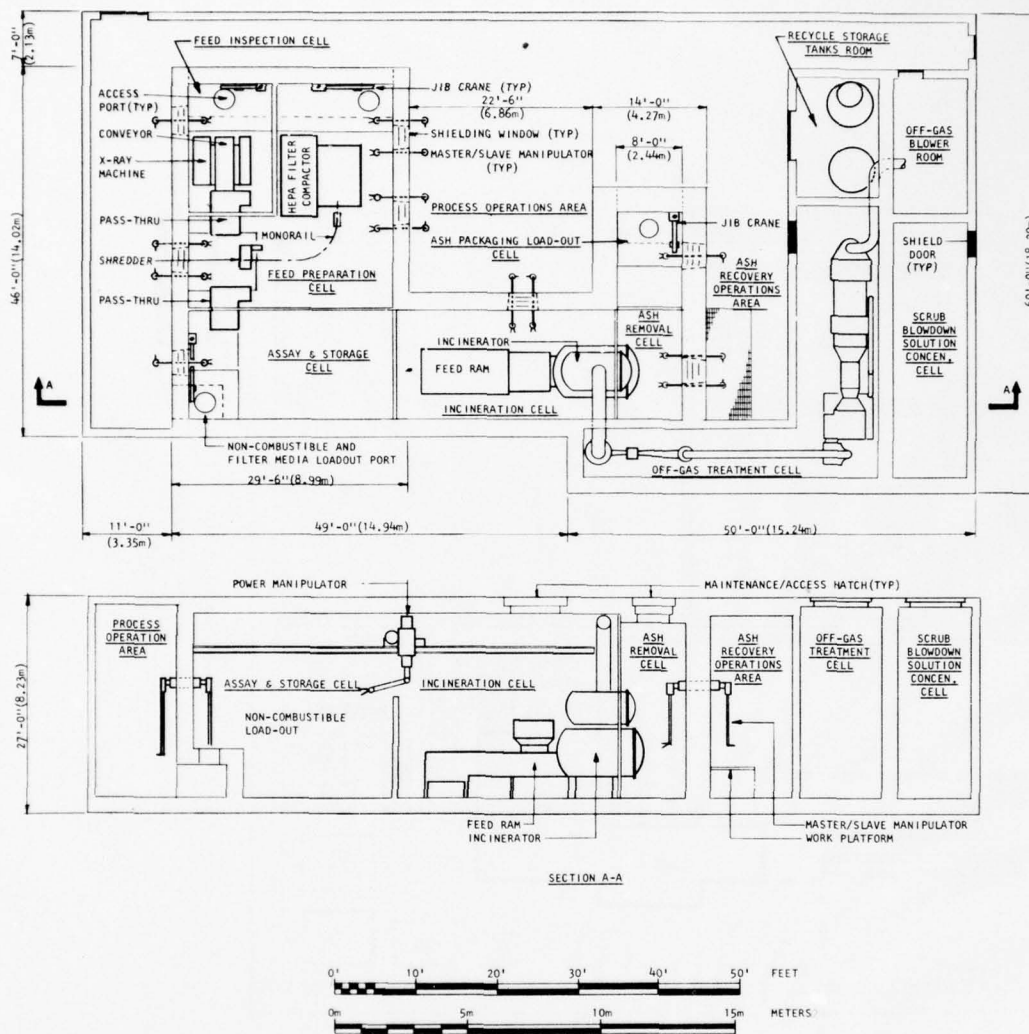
Fuel Reprocessing Plant ILW Incineration Facility, General Plan and Section A-A
